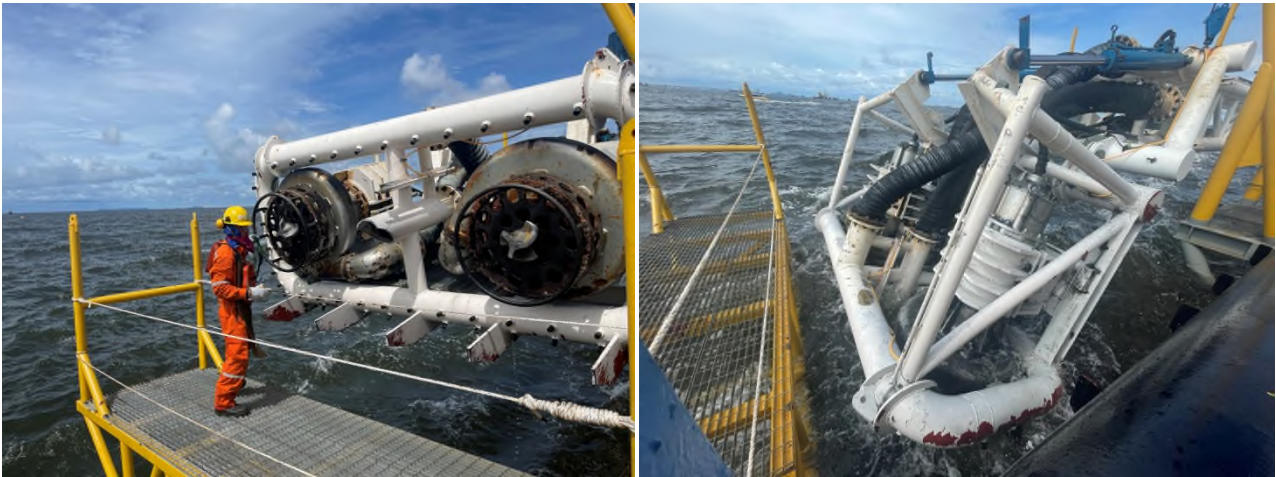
Pre-trenching Trailing Arm with Submersible Dredge Pump Components (Bottom section)
